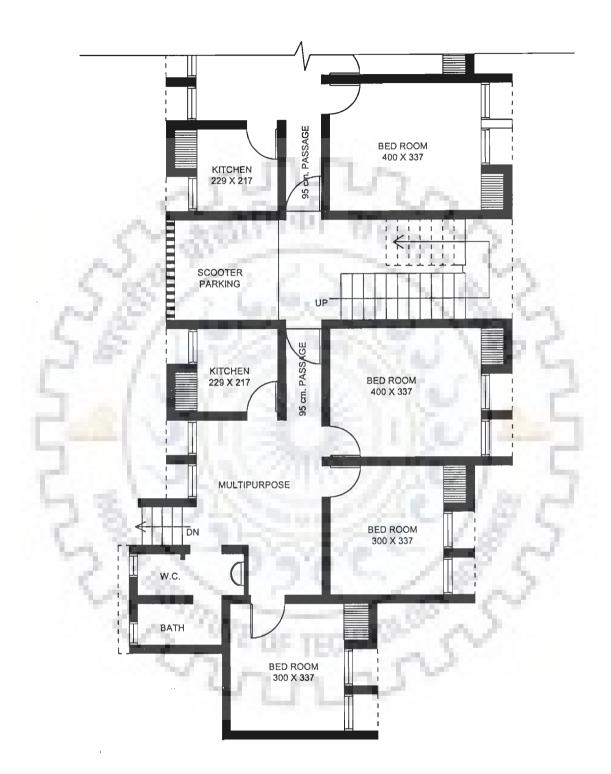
(a) - Ground Floor Plan of Project No. 15 (One Unit)
